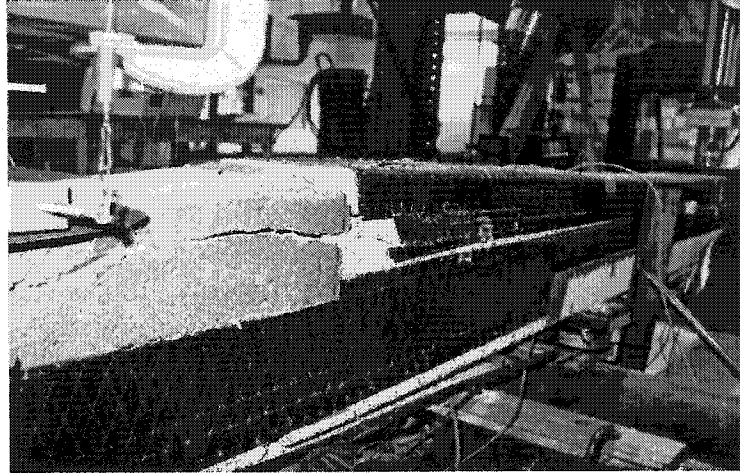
Shear-tension failure at sheet end of beam CTC
